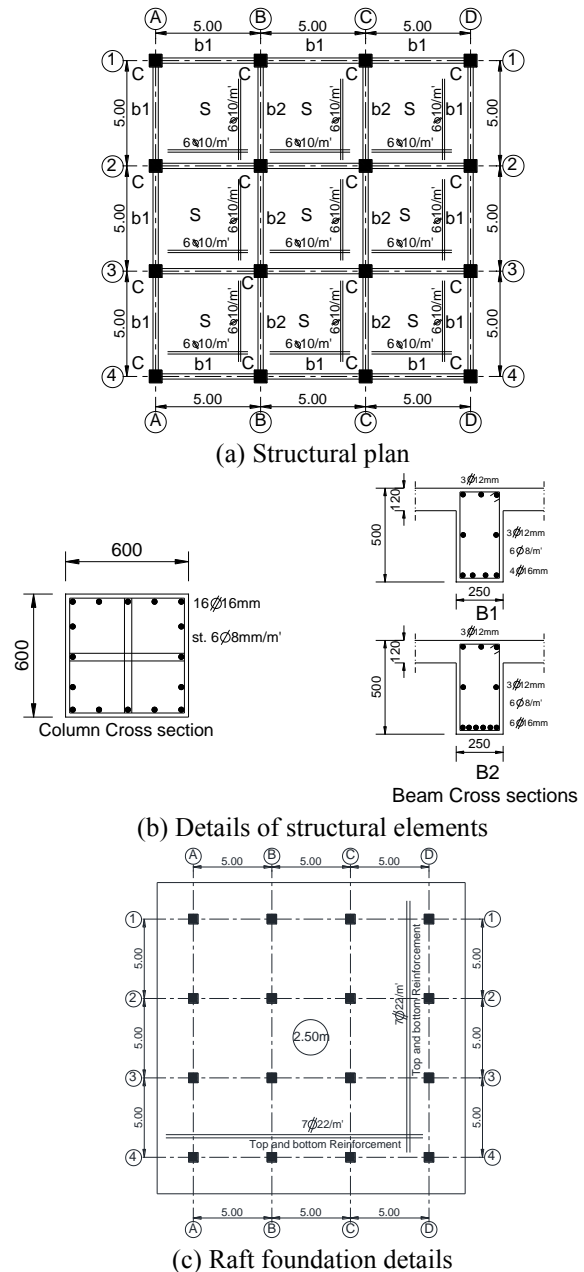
The structural plan and details of the structural elements and the raft foundation of the HRB model
